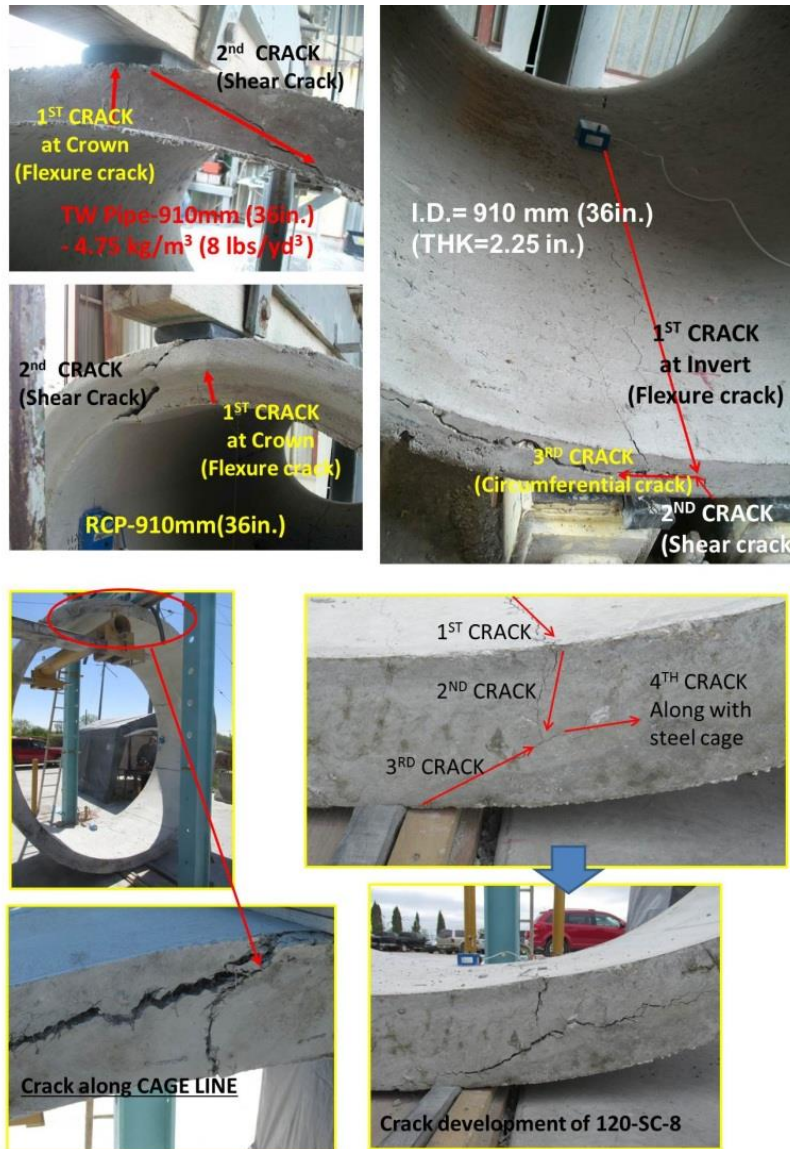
Crack development of TW pipes: 910 mm (36in.) and 3050 mm (120 in.)
